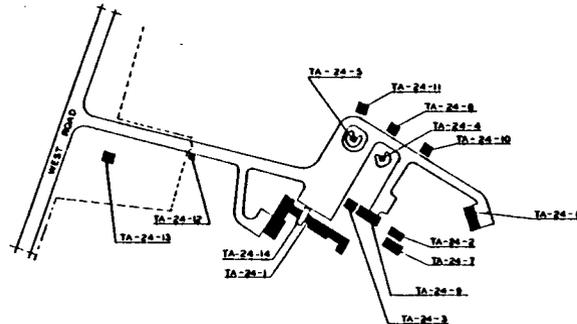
Structure Location Plan for TA-24 - T Site
